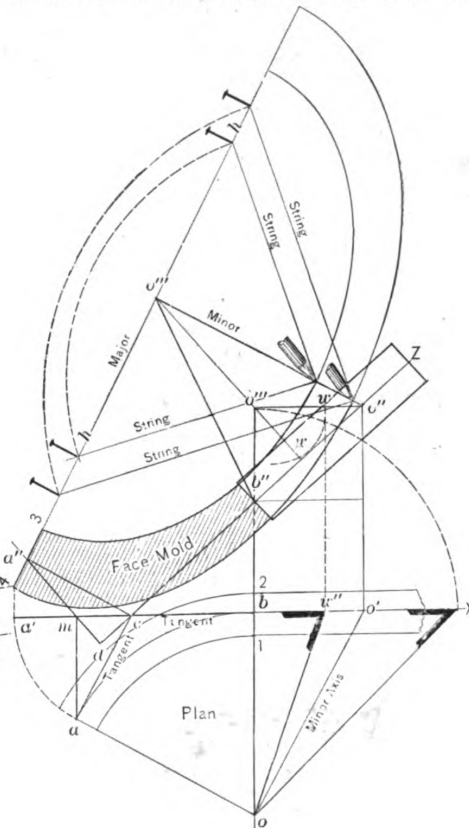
Plan Similar to that Shown in Fig. 1, the Ellipse Being Drawn by String and Pencil.
